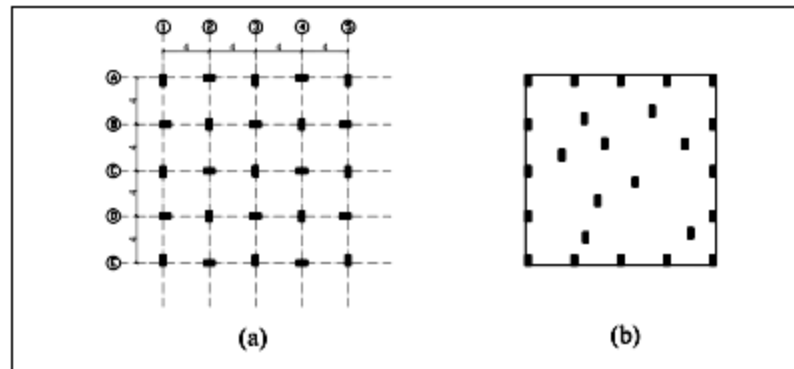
Regular and Irregular Vertical Structural System Configuration in Plan
